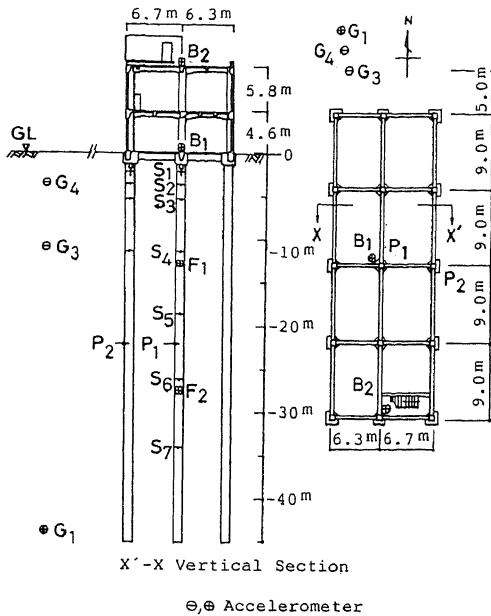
Vertical section and floor plan of pile-supported structure, including layout of instruments, (Ref. 11)
